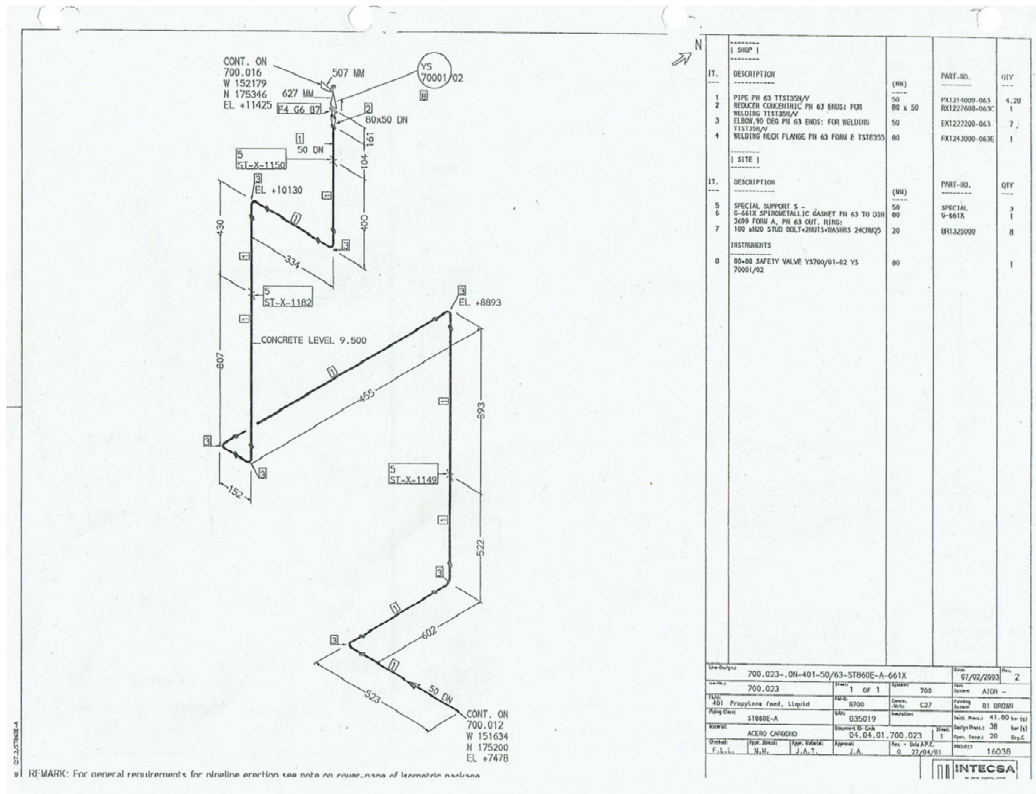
Isometric drawing of YS700-01 sheet 1.
